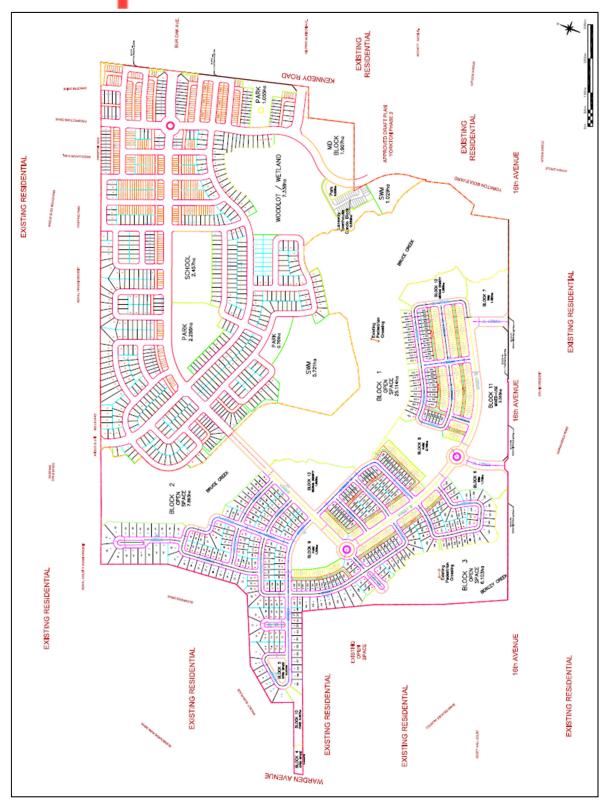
Proposed System Layout – Showing Street Configuration and Building Types
